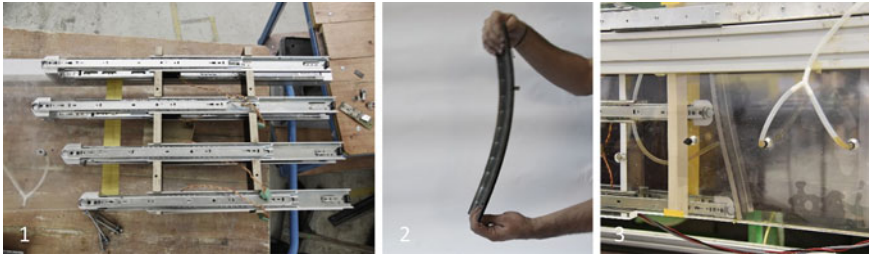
Process details for application 3 in Fig. 2.17: 1. linear actuators for deformation within formwork; 2. scaled metallic strip for deformation; 3. capillary oiling system in constructed formwork
